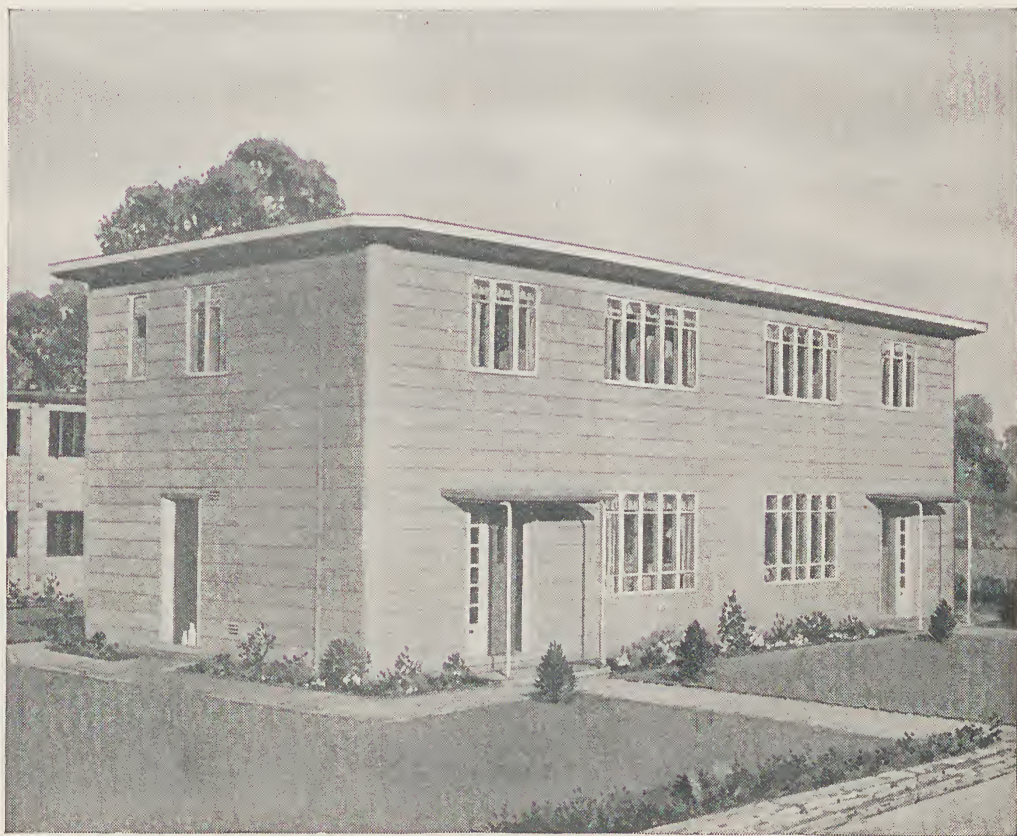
A pair of "Airey" prefabricated concrete houses.
